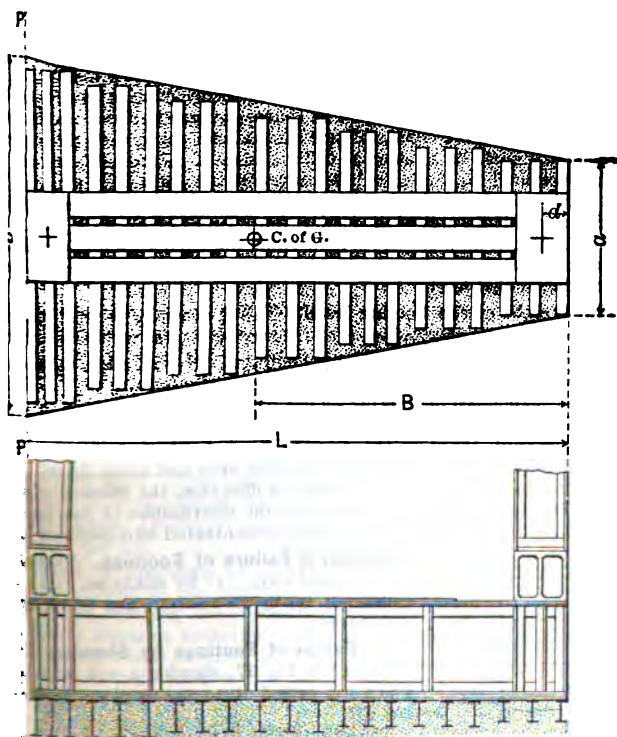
Girdering-method of Foundations. Two Unequal Loads
